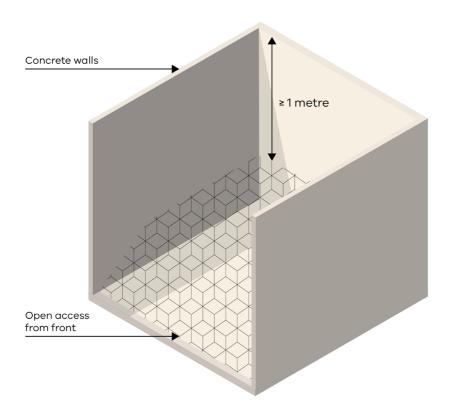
Recommendations for separating CRWM using bunker (fire) walls.
